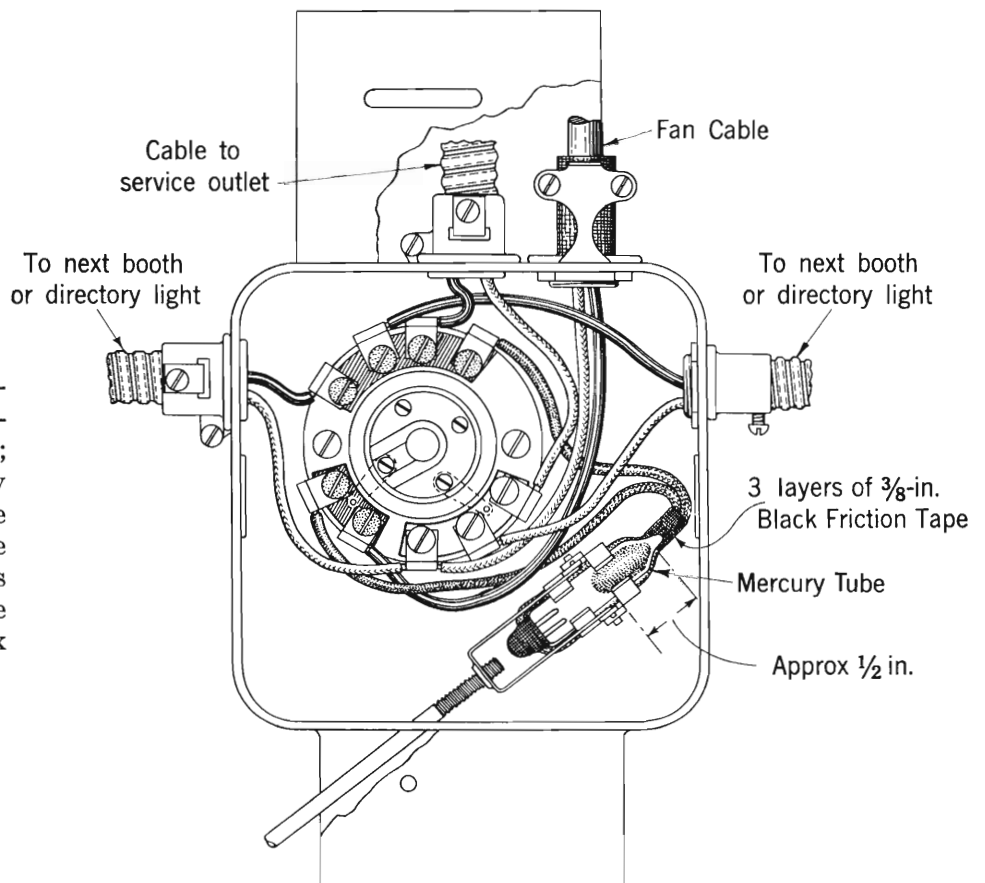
Typical Cutout Switch Installation with 4-type Light Fixture
